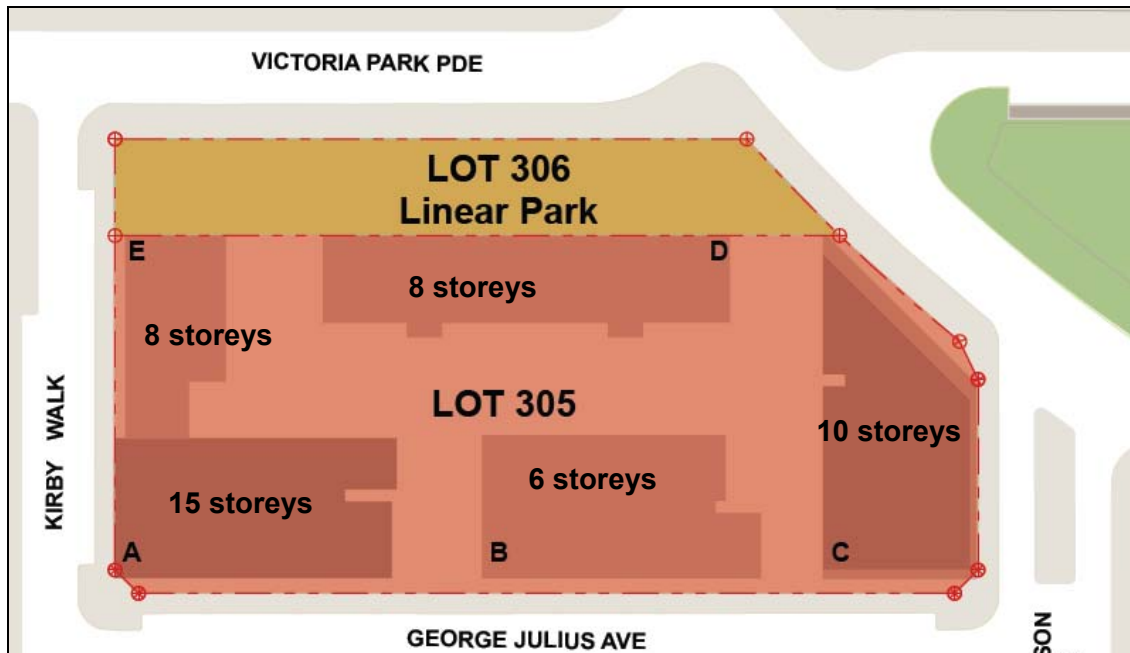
Proposed footprints of the 5 residential apartment buildings
